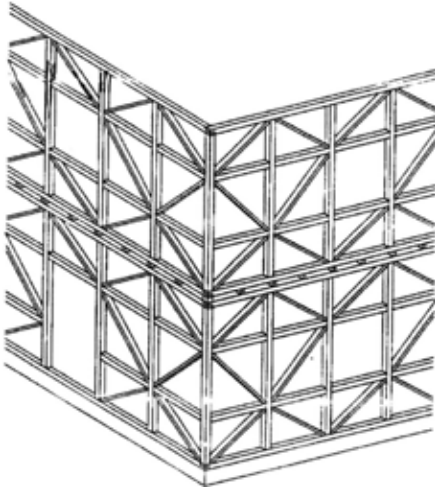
Diagonal bracing, as illustrated in the Turkish Earthquake Code.
